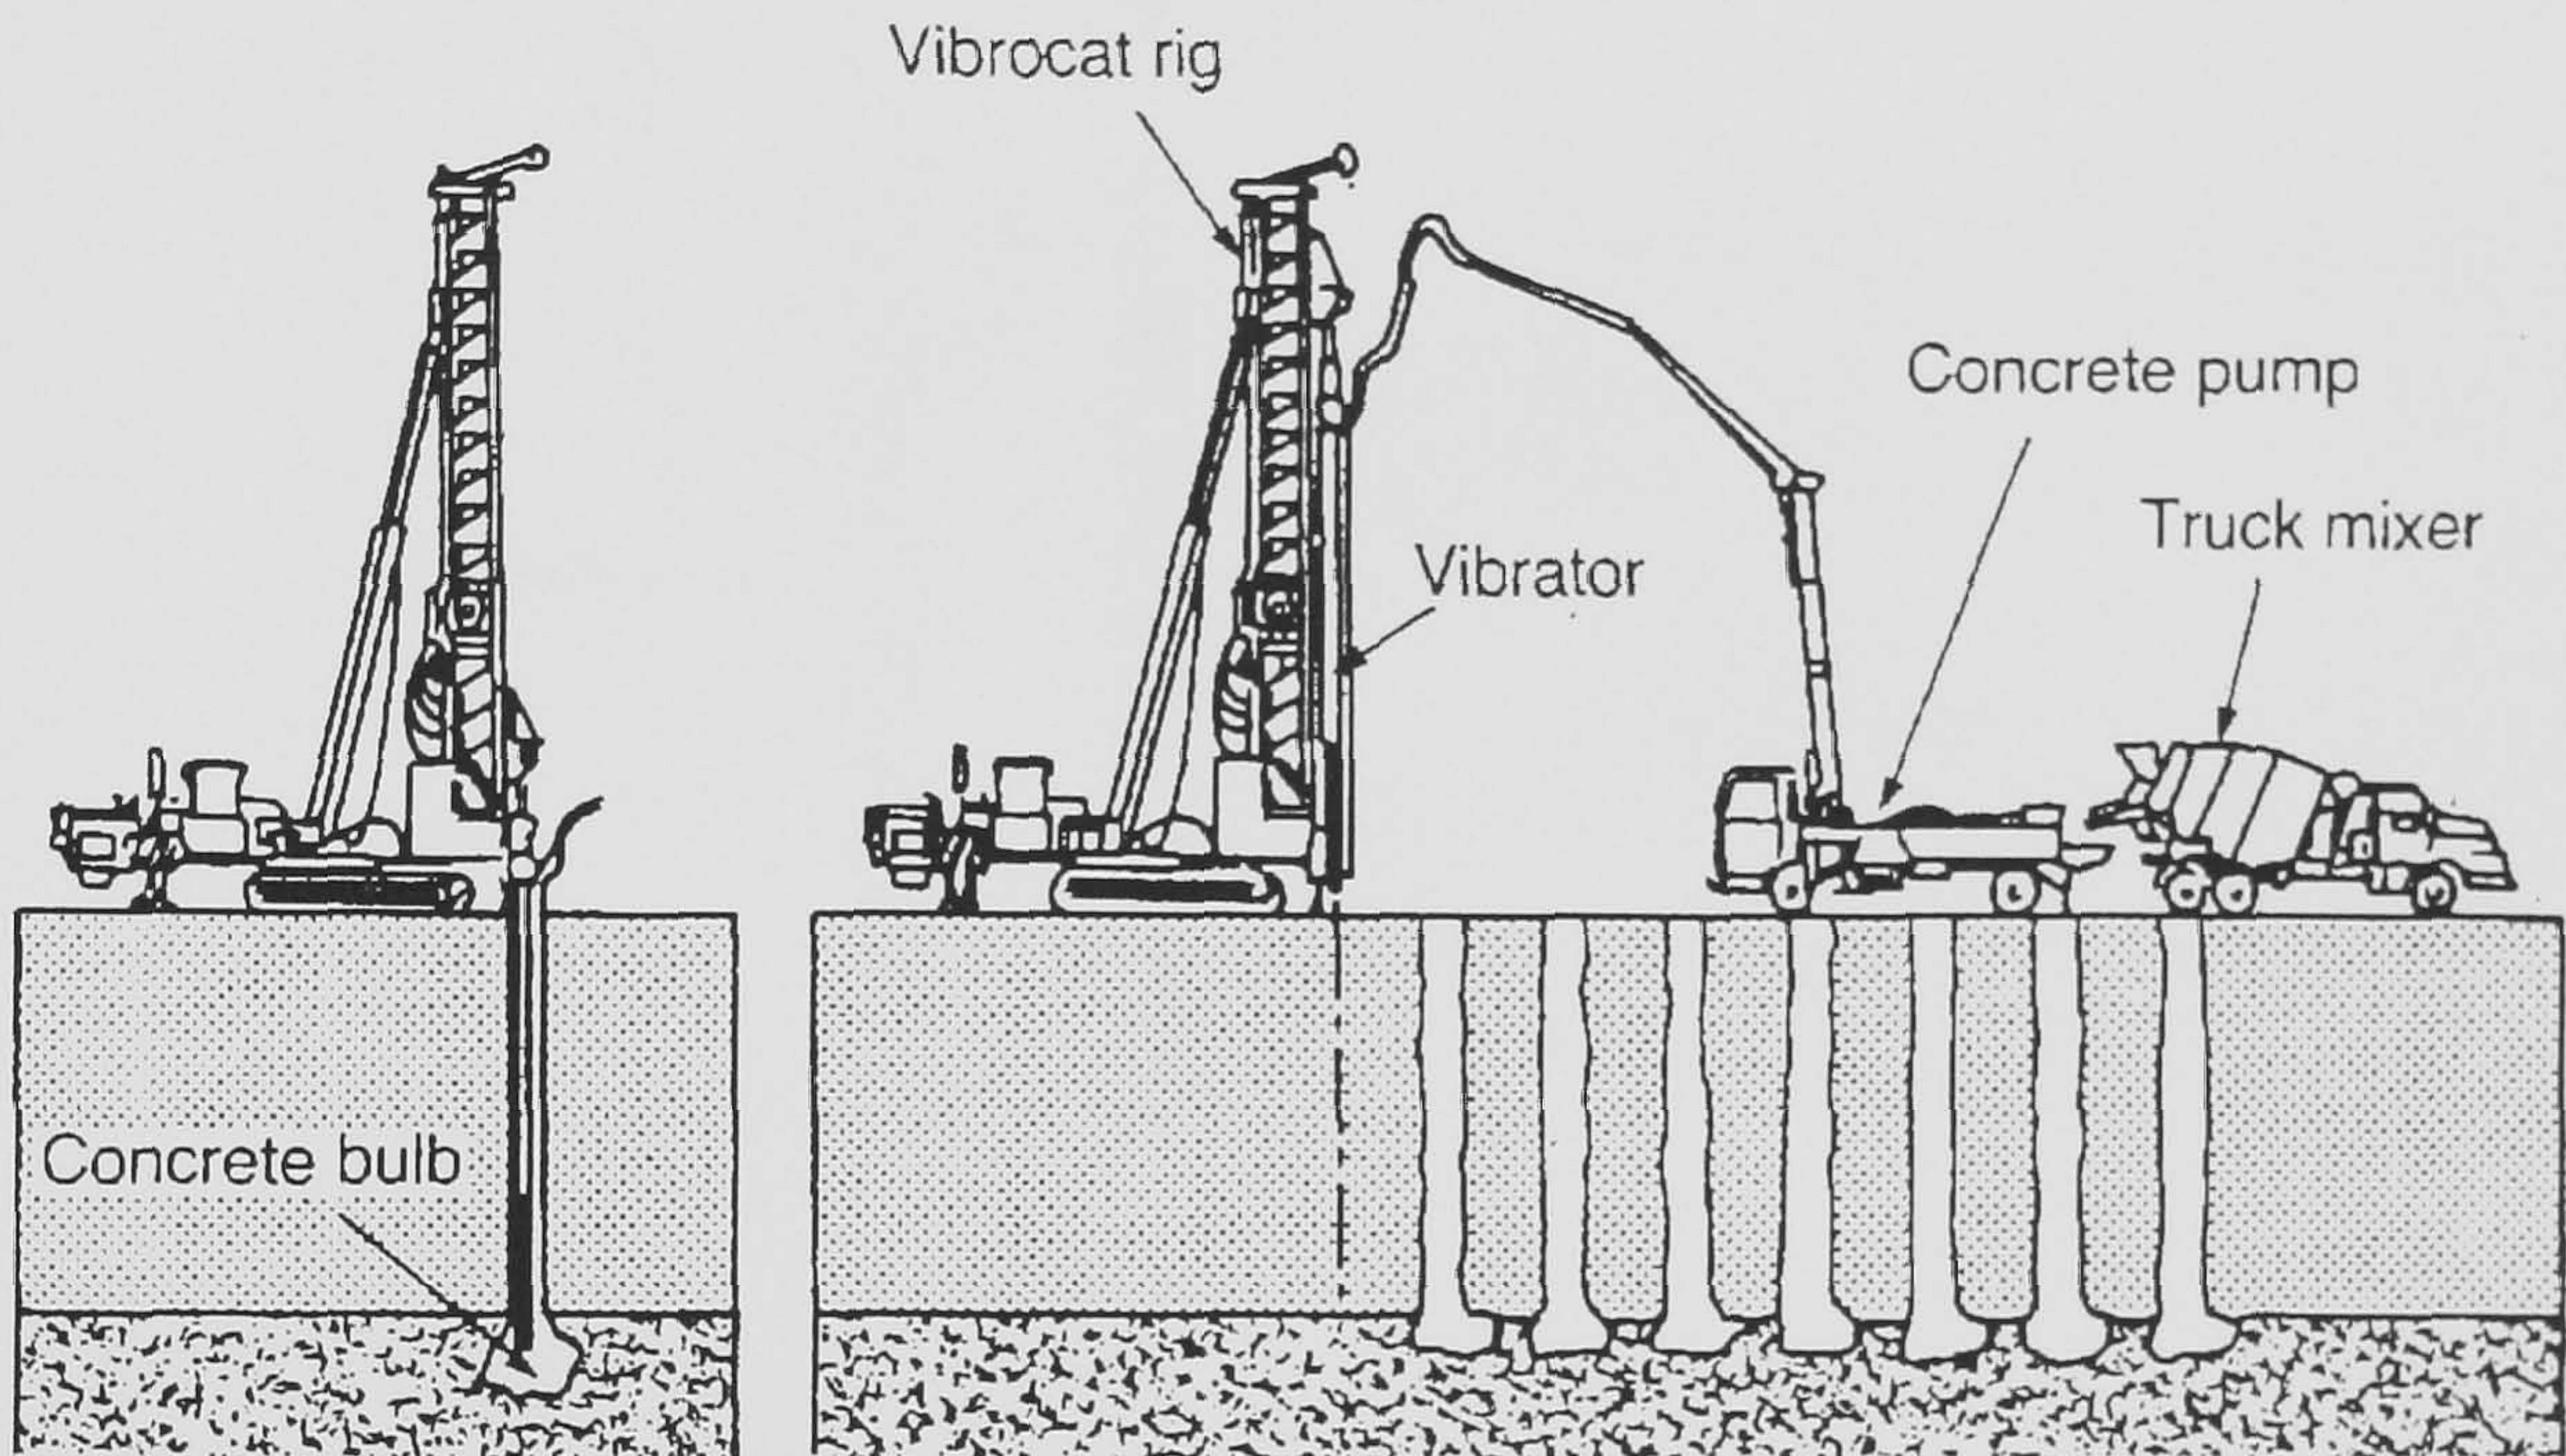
Construction sequence of vibrated concrete columns (Bell 1993b)
